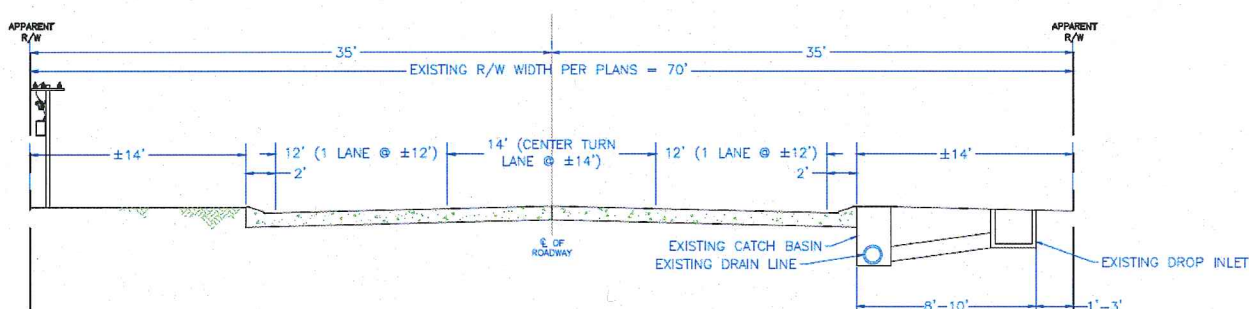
LA 1040 – Old Baton Rouge Highway to US 51 – Existing Typical Section Facing East
